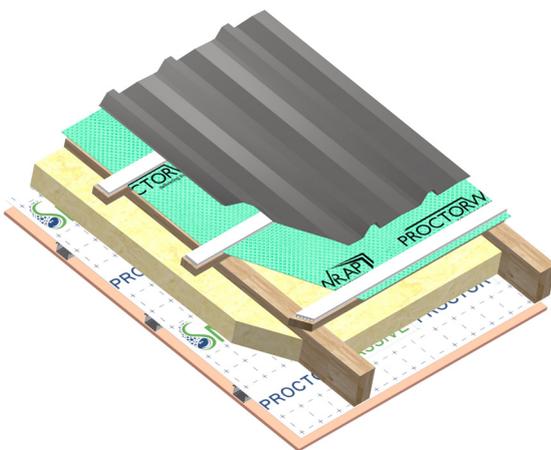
Where the sarking is installed above roof battens, the ProctorVent VB10 drainage batten is installed above the sarking to create a free path for drainage and air movement.
